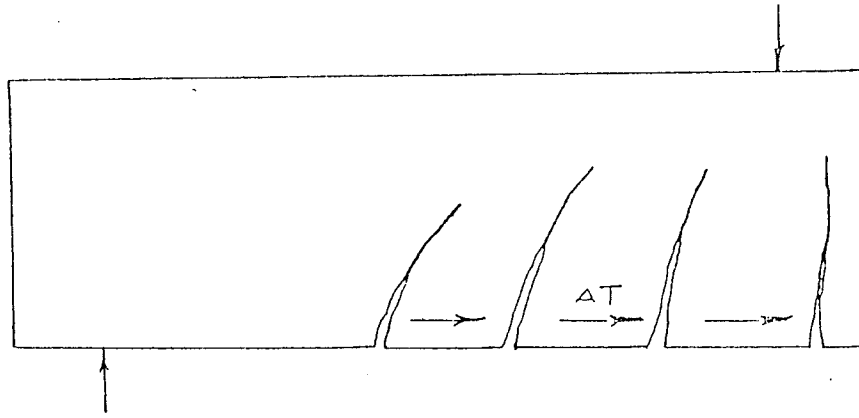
FLEXURAL CRACKING DUE TO BOND FORCES AND ACTION OF CONCRETE CANTILEVERS
